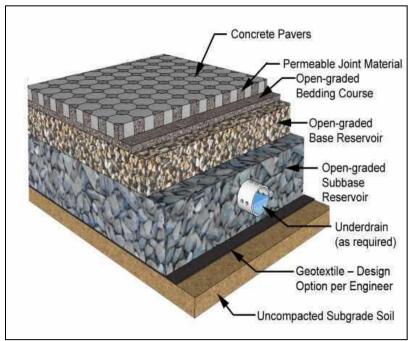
Schematic Profile for Typical Permeable Pavement Section (Source: David Smith, ICPI).
